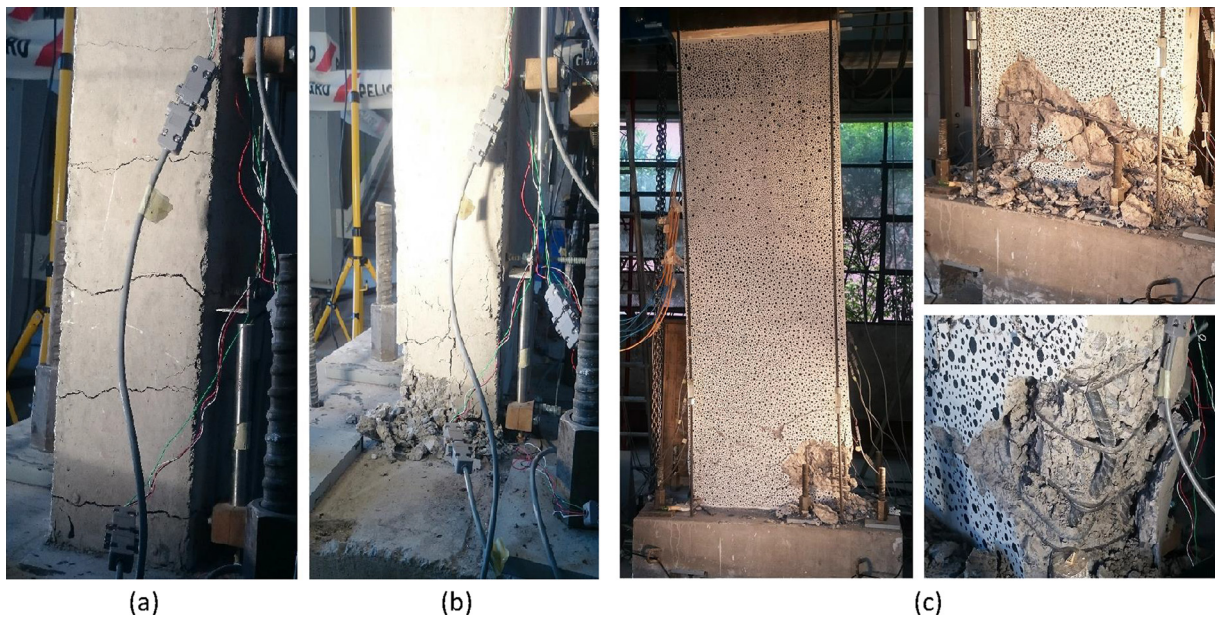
Specimen W1 – (a) Cracking at 2% drift in the tension side for negative loading, (b) Spalling at 3% drift in the compression side for positive loading, and (c) final state.
